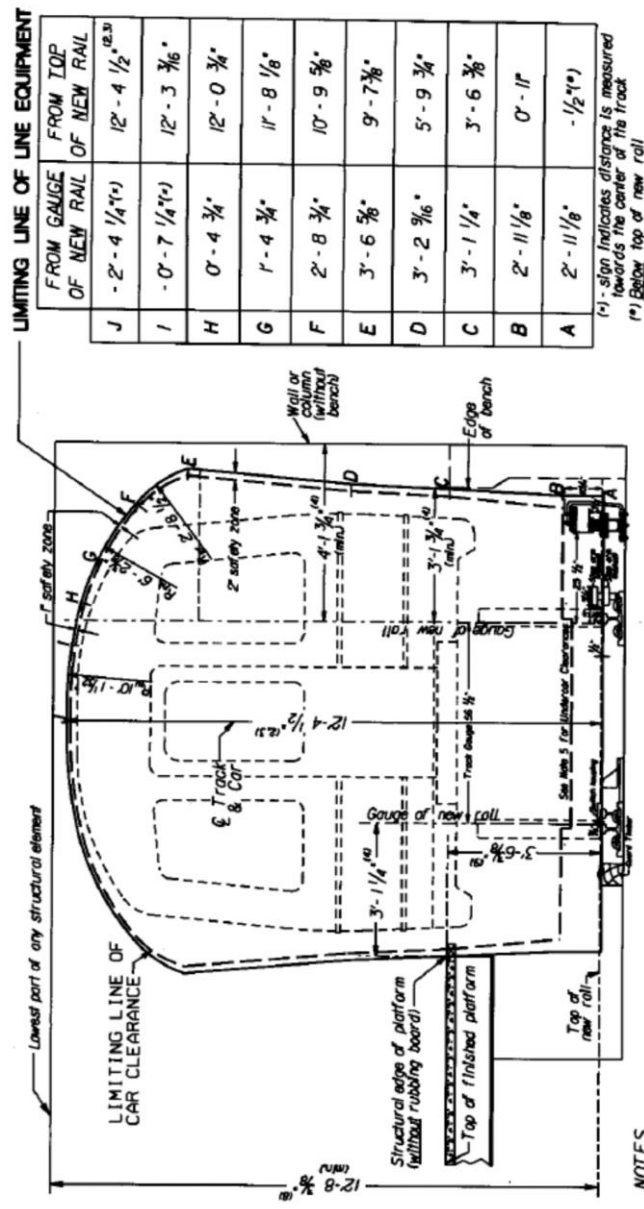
East New York Tunnel space-proofing study for NYCT A Division railroad car
